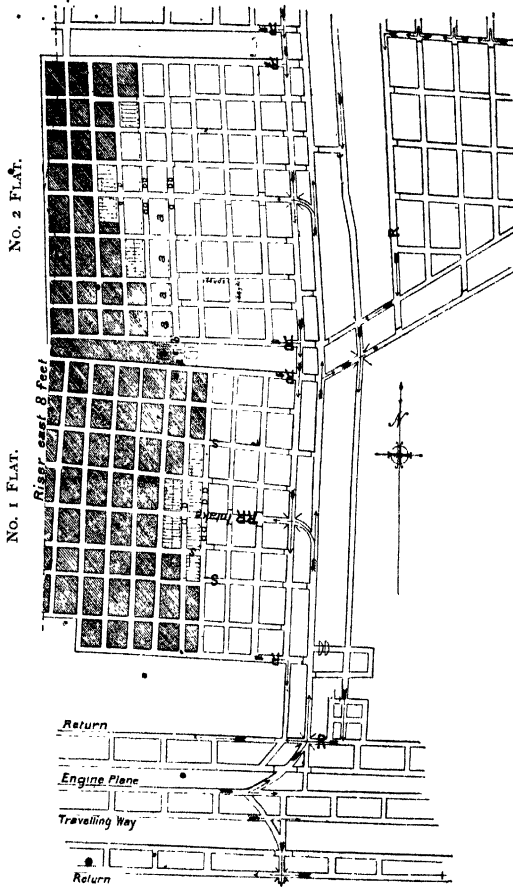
Plan of Broken Workings, Bord and Pillar System.
